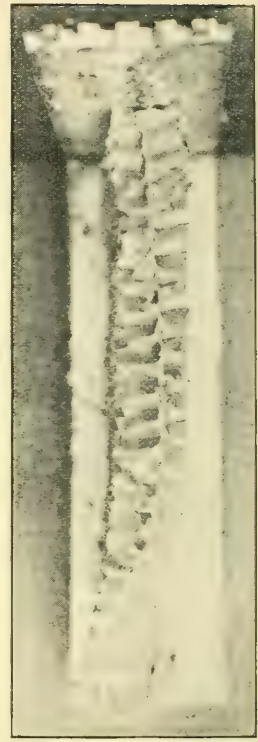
SECTIONAL VIEW OF FIG. 1.
